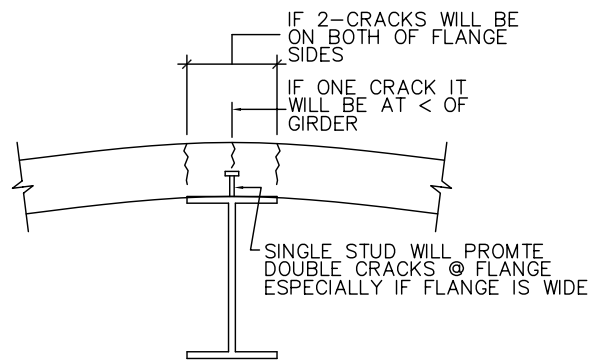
Cross-Section Through Slab at Filler Beam and Girder
